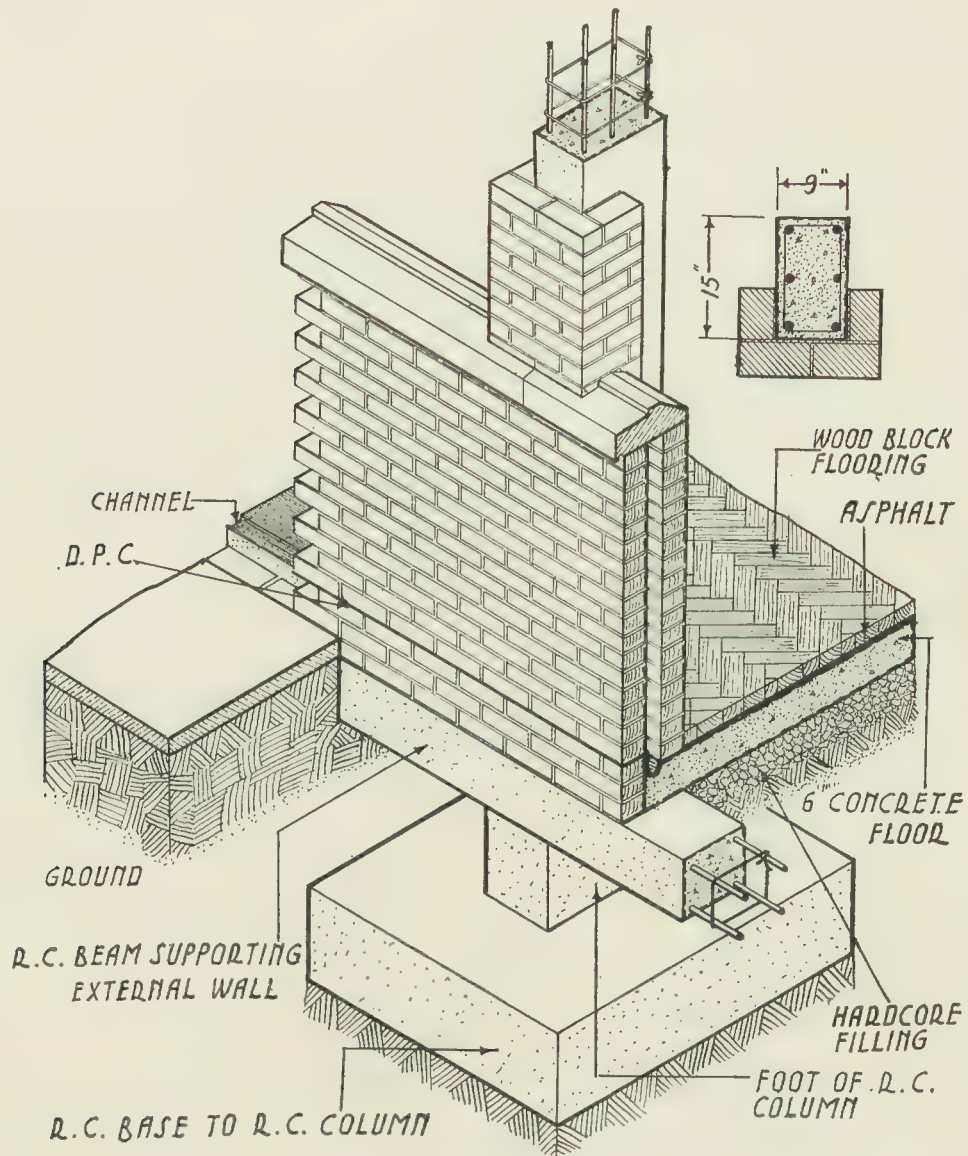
BASE OF REINFORCED CONCRETE FRAMED STRUCTURE
